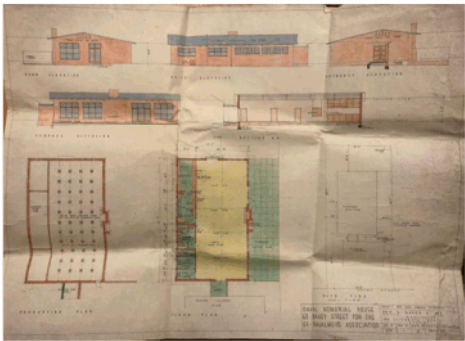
Floor and site plan for the Havel Memorial House, 1953. Thompson Archive and Heritage Office AD4171/14625
